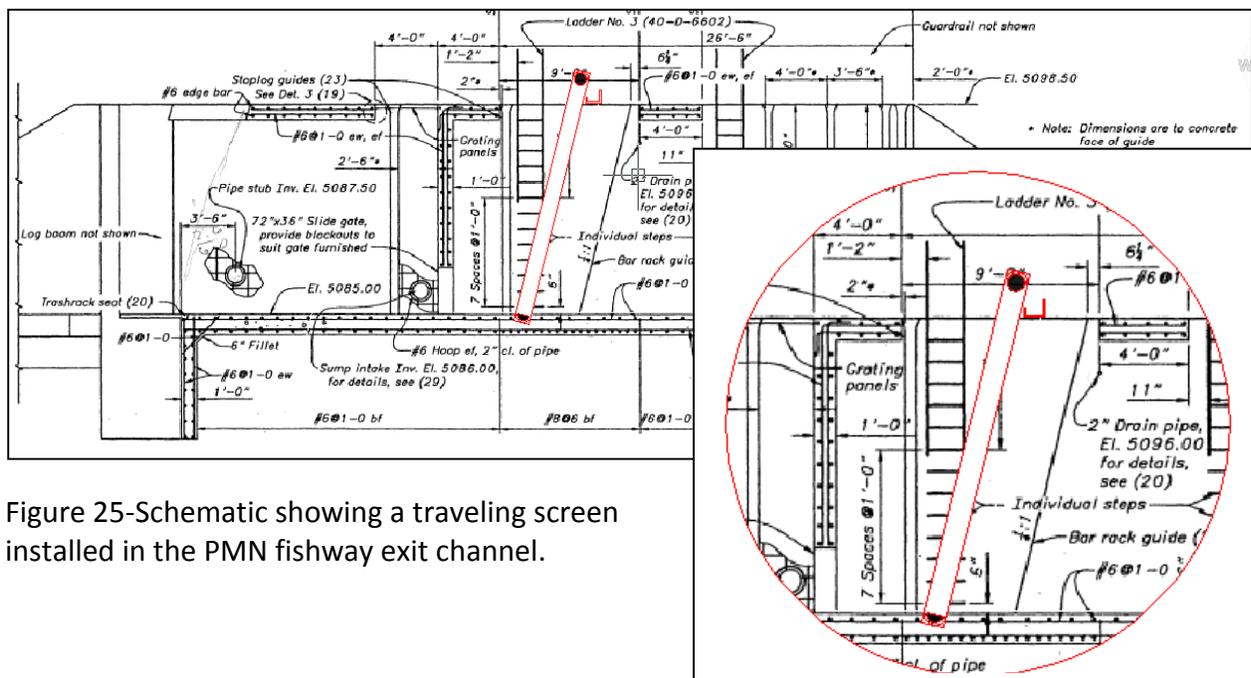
Schematic showing a traveling screen installed in the PMN fishway exit channel.
